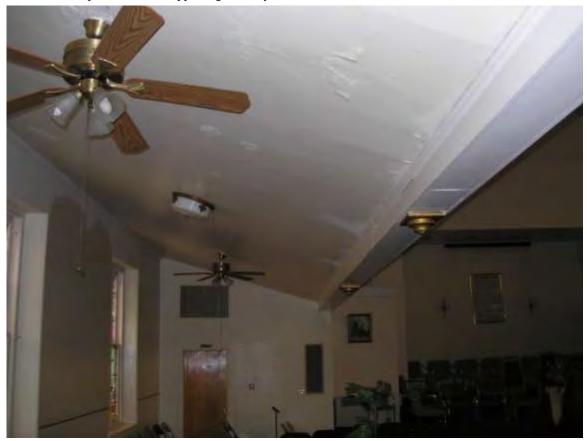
Sloped Ceiling below Balcony Showing Suspension Rod Support Locations
